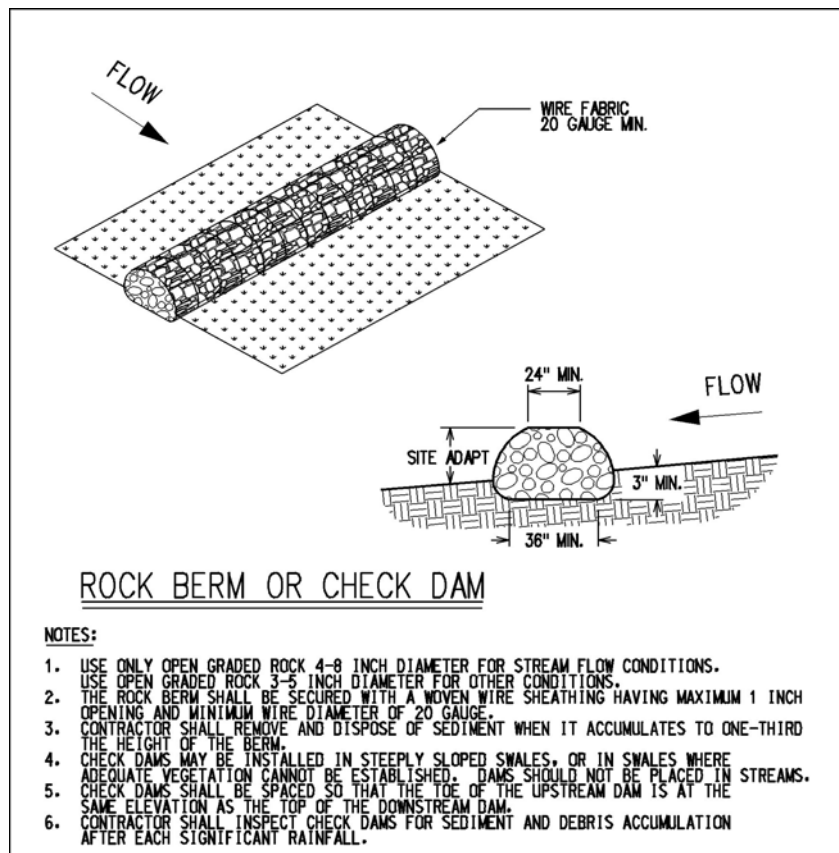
An illustration of a rock berm or check dam stormwater control structure.
